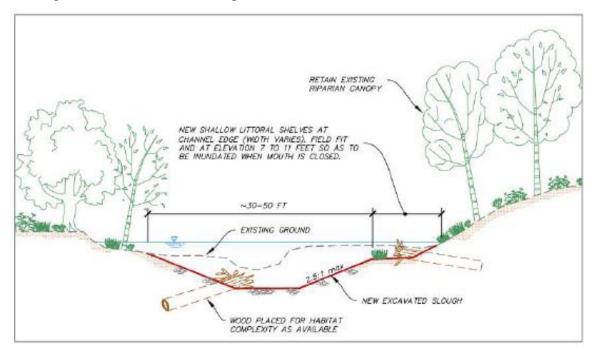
Example of typical slough excavation construction (from Michael Love & Associates 2017).
